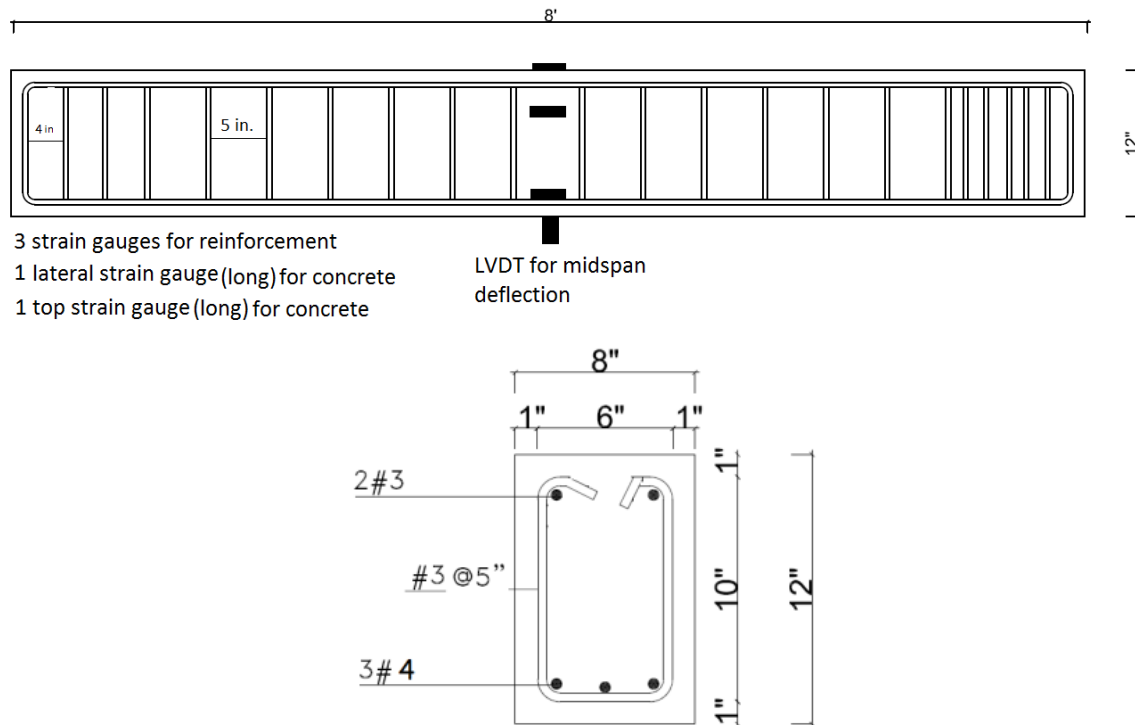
Reinforcement layout and locations of strain gauges for test beams
